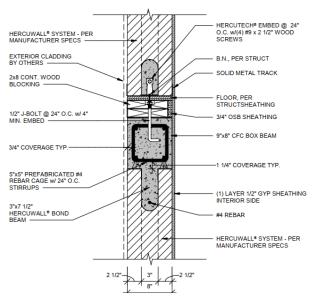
Typical HercuWall® CFC Box Beam Wall Construction with Lumber Embed
